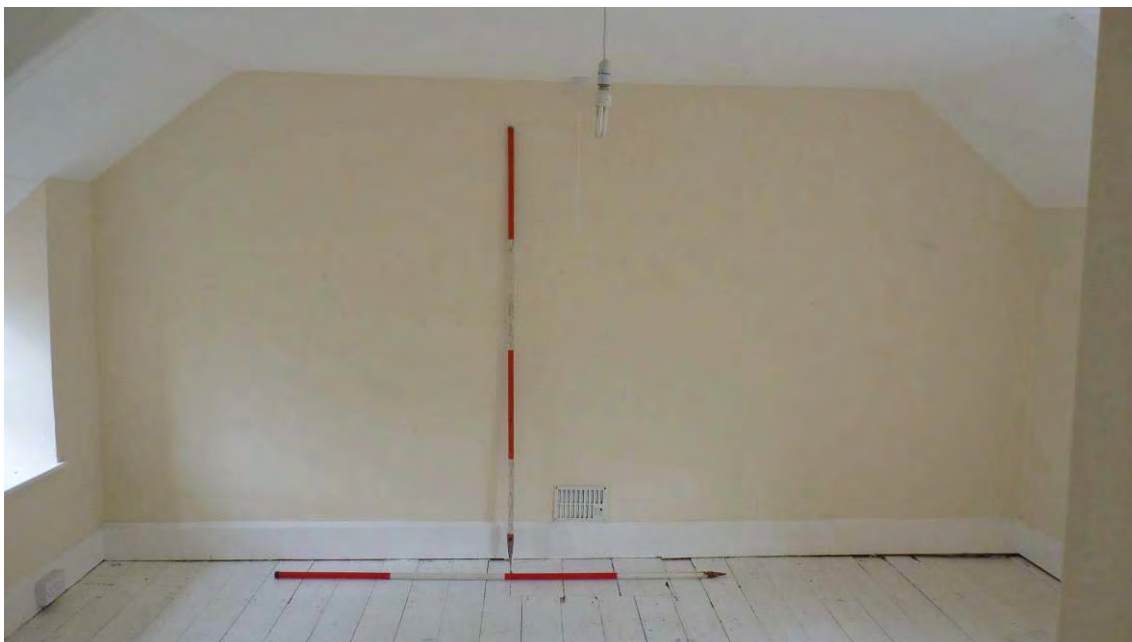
The Farmhouse interior, 1<sup>st</sup> floor, Room 6. Looking East. 2m scales.
